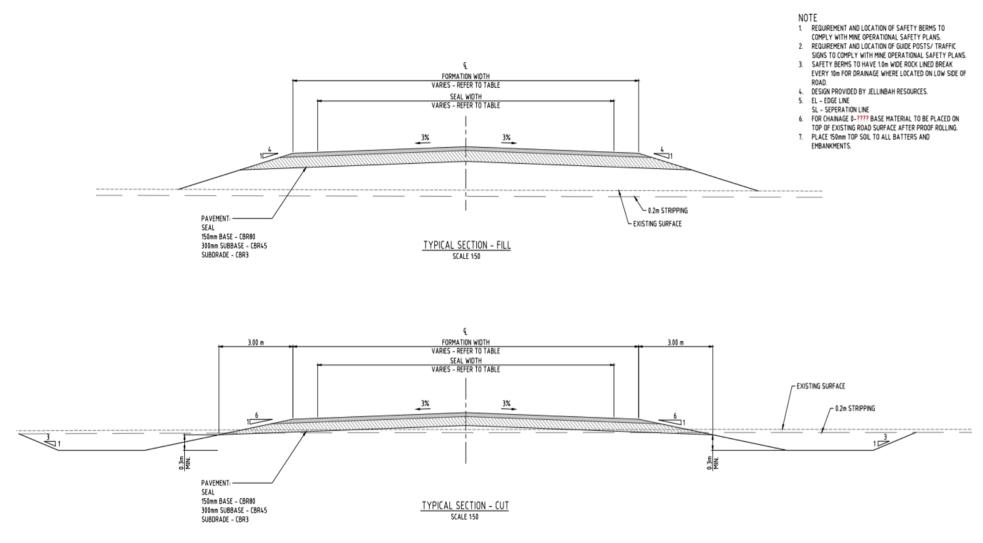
Conceptual cross-sections of the Project access/haulage road
